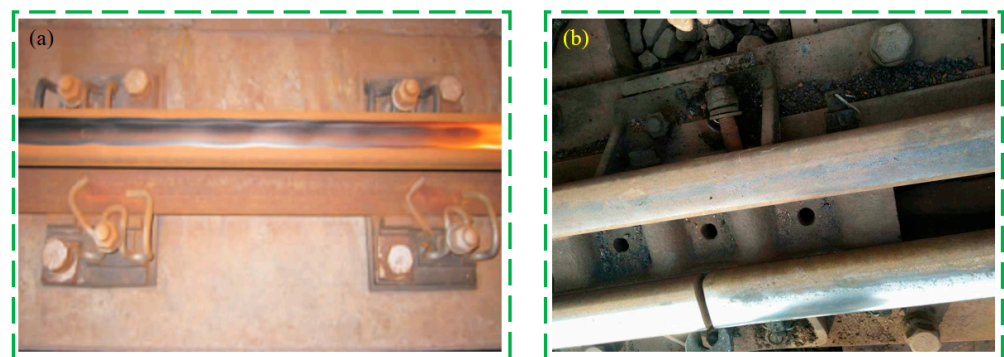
(a) Cracked clips on corrugated rail; (b) bolt fracture.
